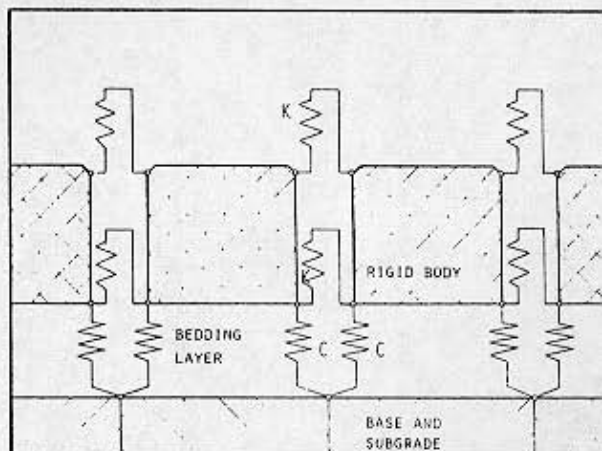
Modelling the concrete block pavement, (after Reference 6)
